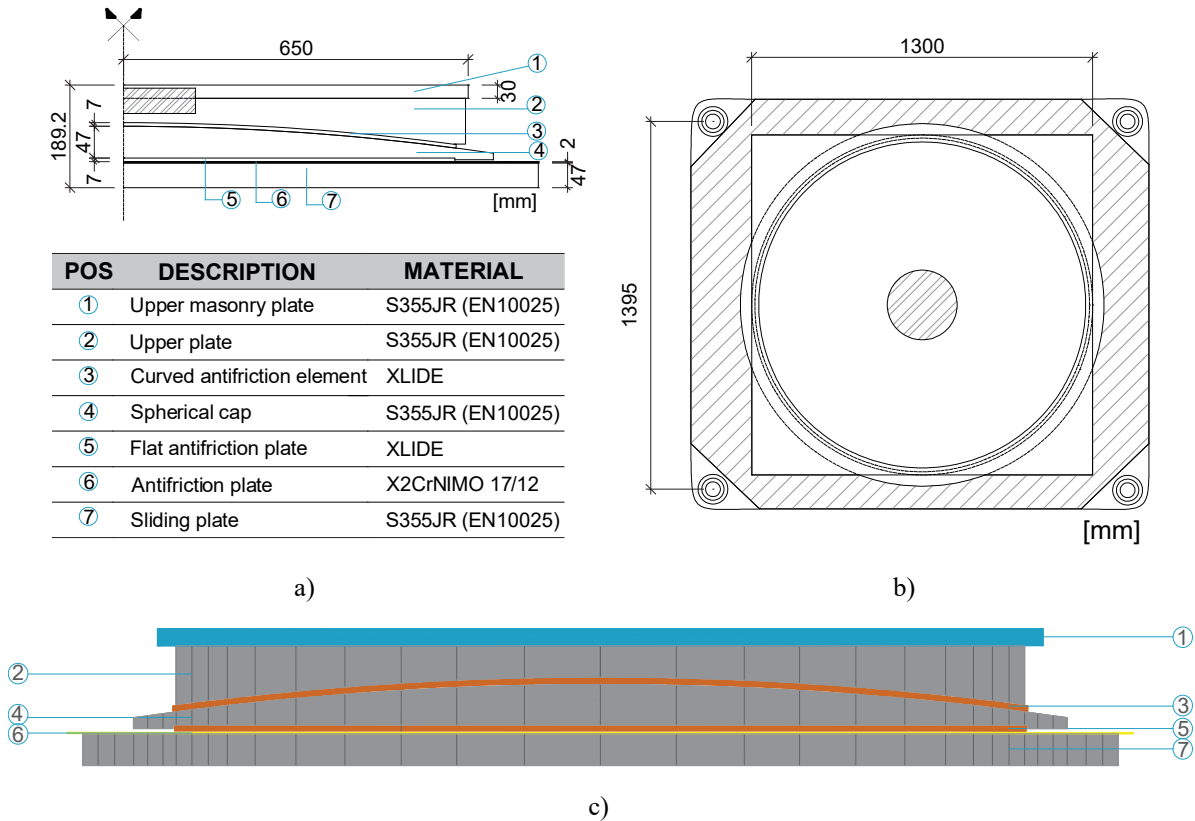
Design drawings of piers P2/P3: a) half of the bearing lateral view, b) floor plan of the bearing, c) schematic representation of the bearing (adapted from GRID et al. (2006)).
